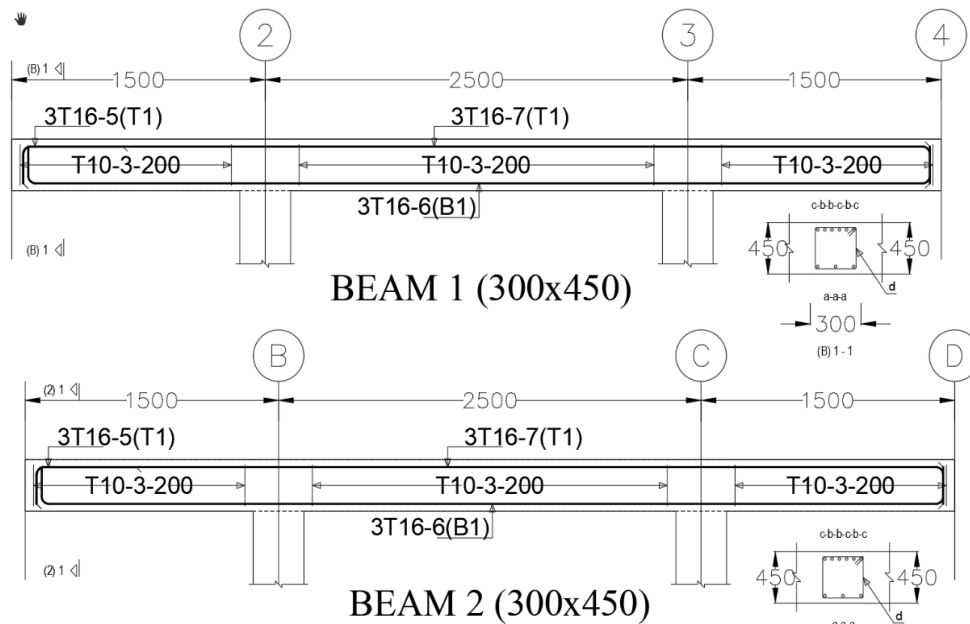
and 4.9 present the detailed reinforcement layouts for the reinforced concrete (RC) storey beams supporting the elevated water tank structure. These beams play a crucial role in transferring loads from the tank platform and bracing levels to the supporting columns while maintaining overall structural stability.
